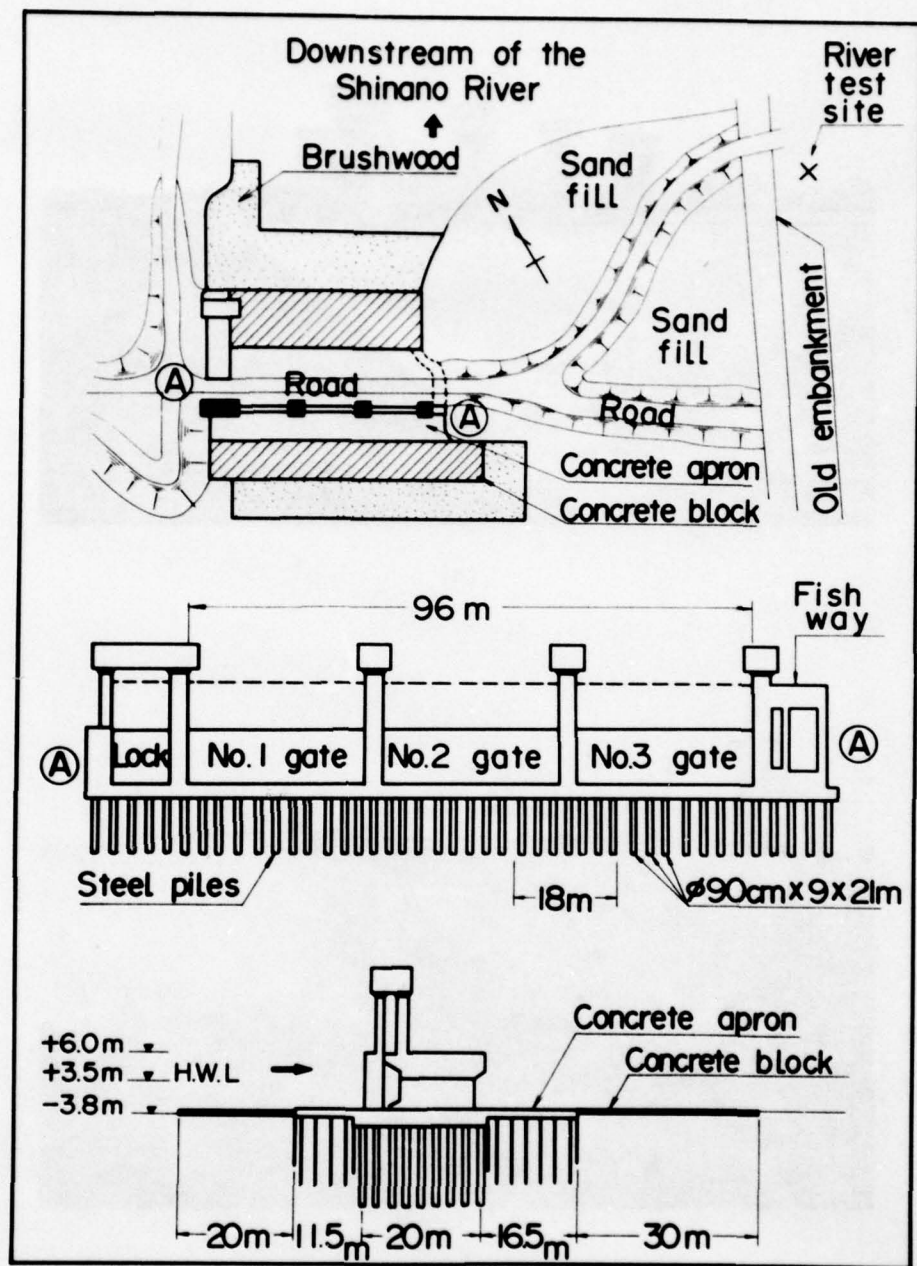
Plan and Cross-Section of Concrete and Sand Diversion Dam, Niigata, Japan.
